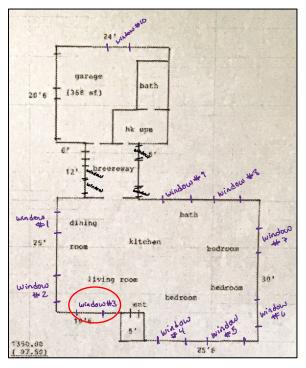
Window plan shows that all existing steel windows will be replaced. All new windows are proposed to be double-hung sash, with the exception of window no. 3 (circled), which will be a horizontal sliding window.
